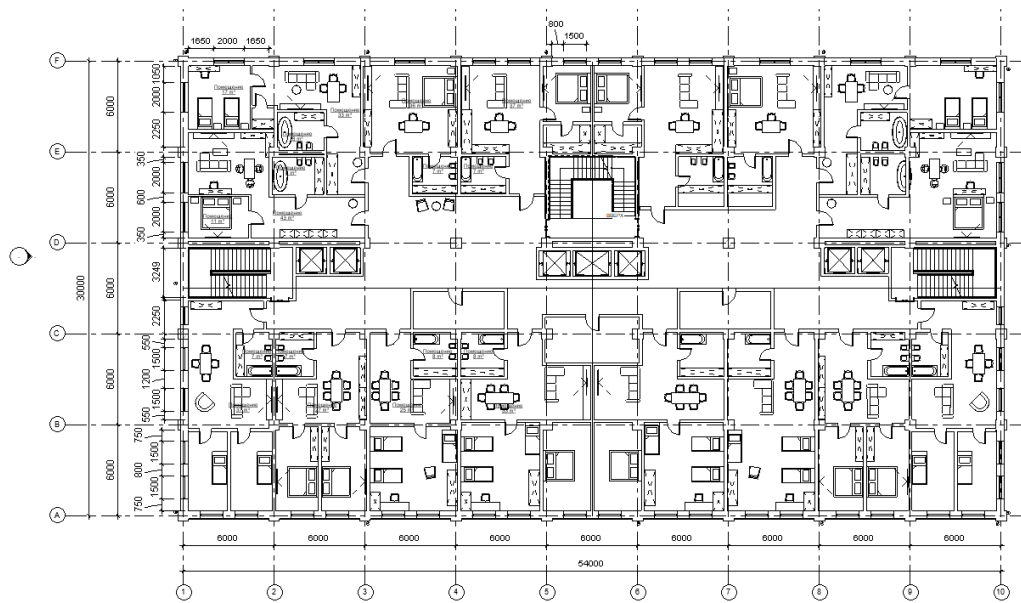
2-15 floor layout2.1.5. Non-structural members design2.1.5.1 Ceiling
